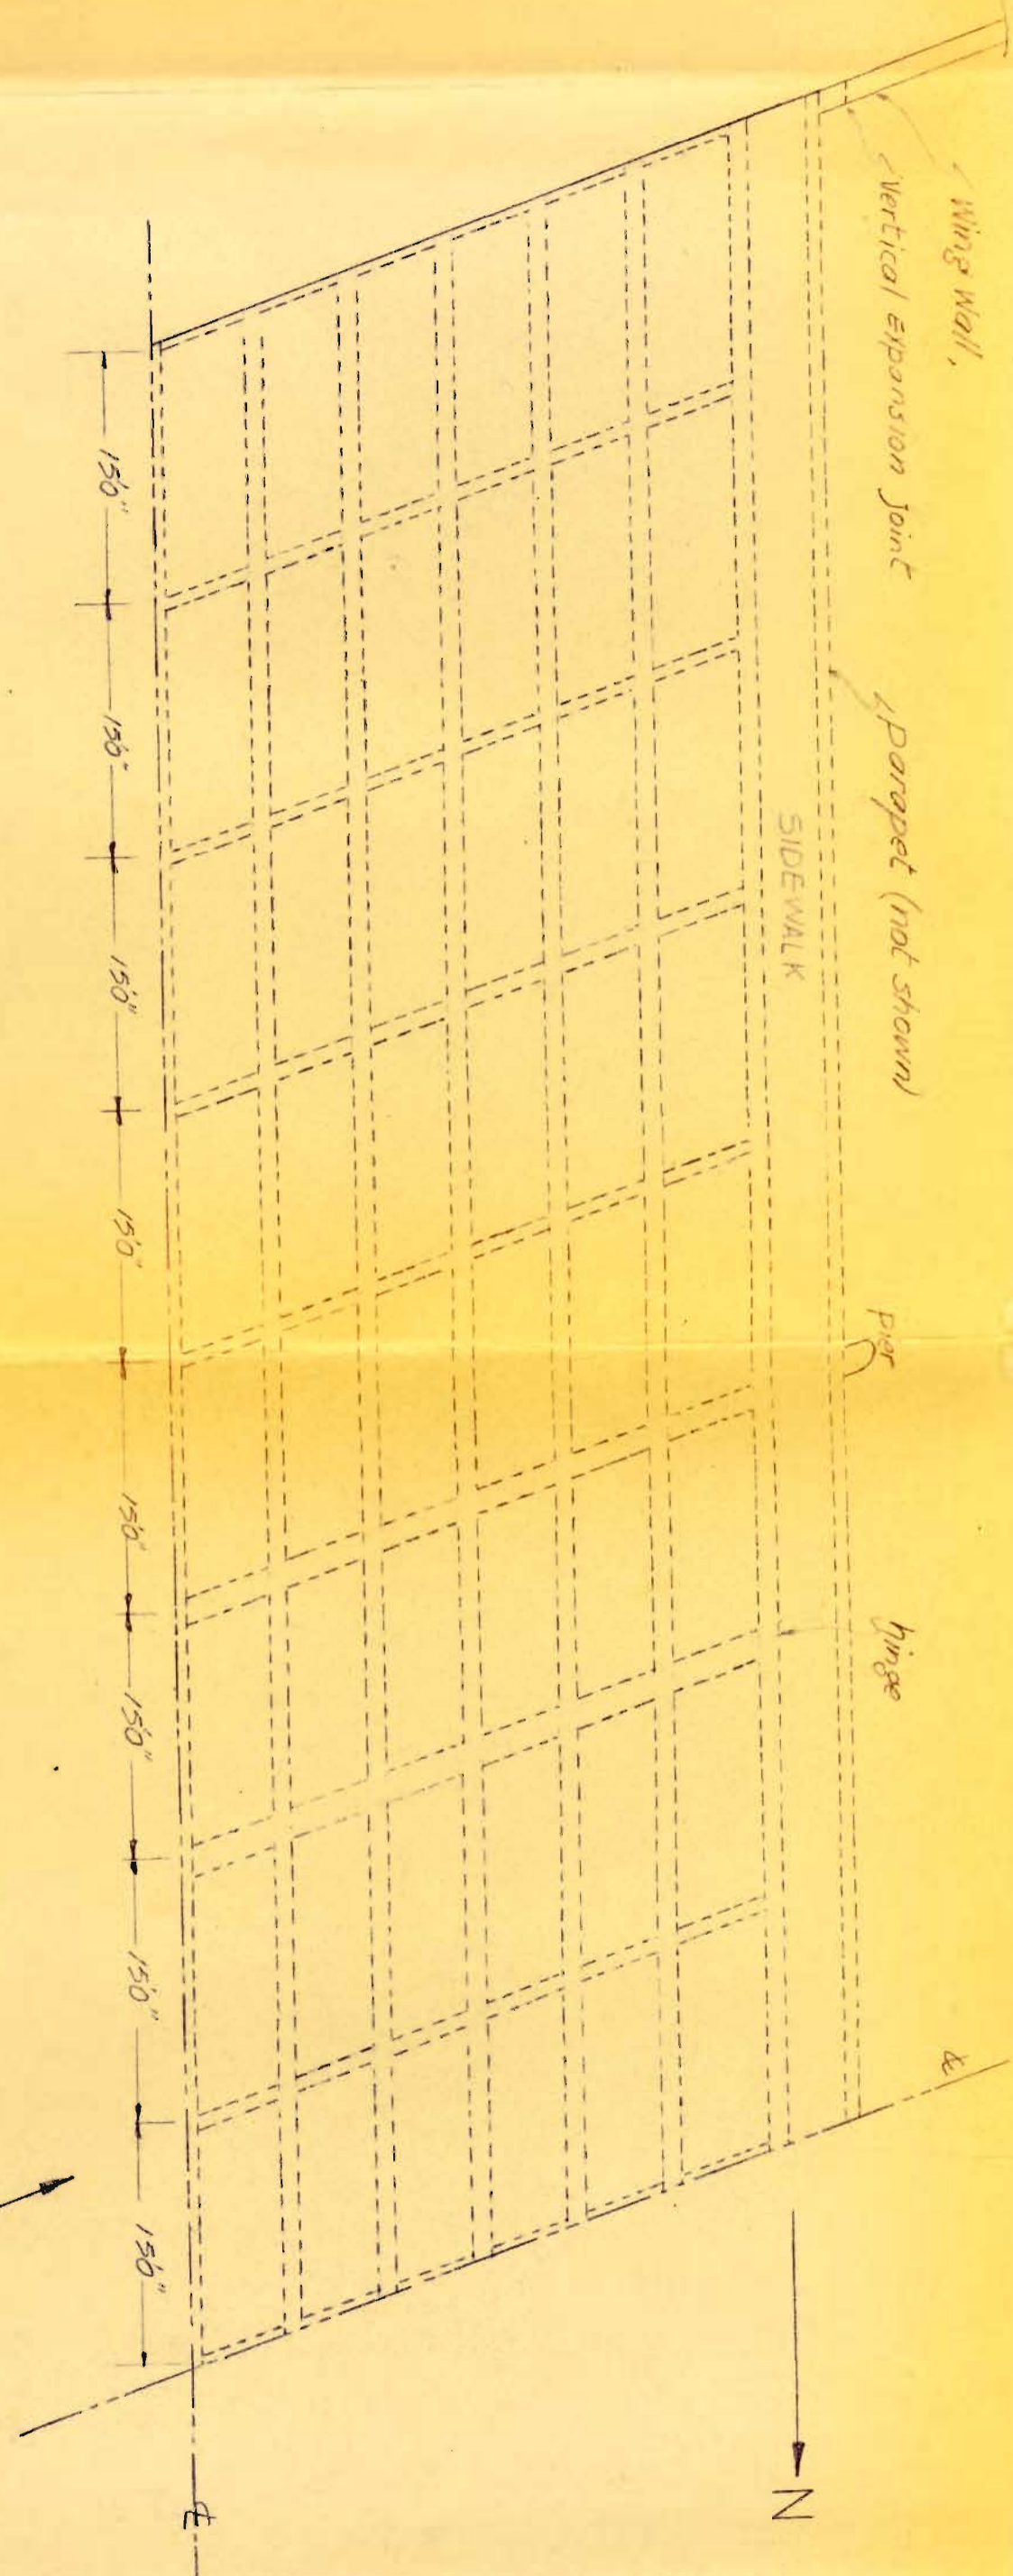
$\frac{1}{4}$  PLAN, Showing cross beams Arrangement.
